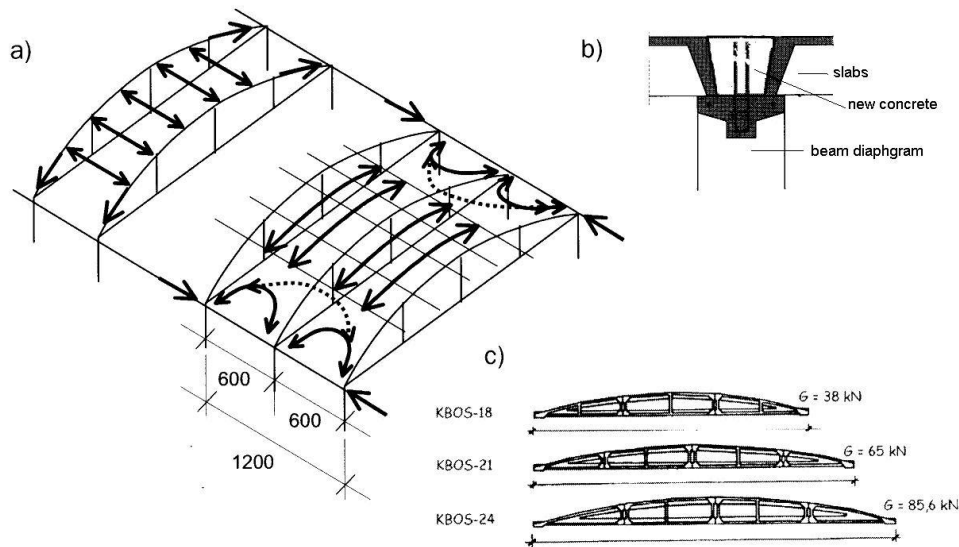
Funicular concrete prestressed beams arc-like with straight tie
